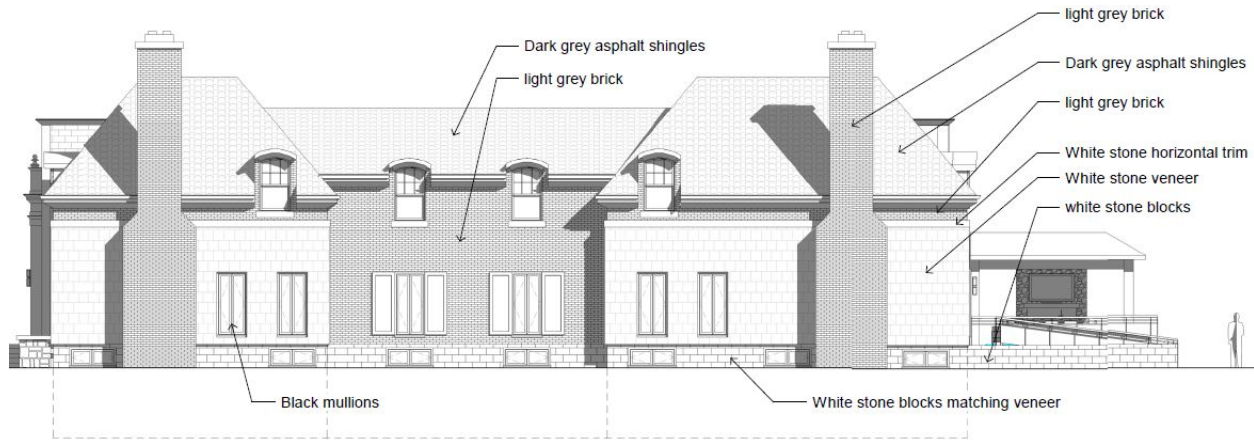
South elevation, 2230 Mississauga Road. (Image from client.)
